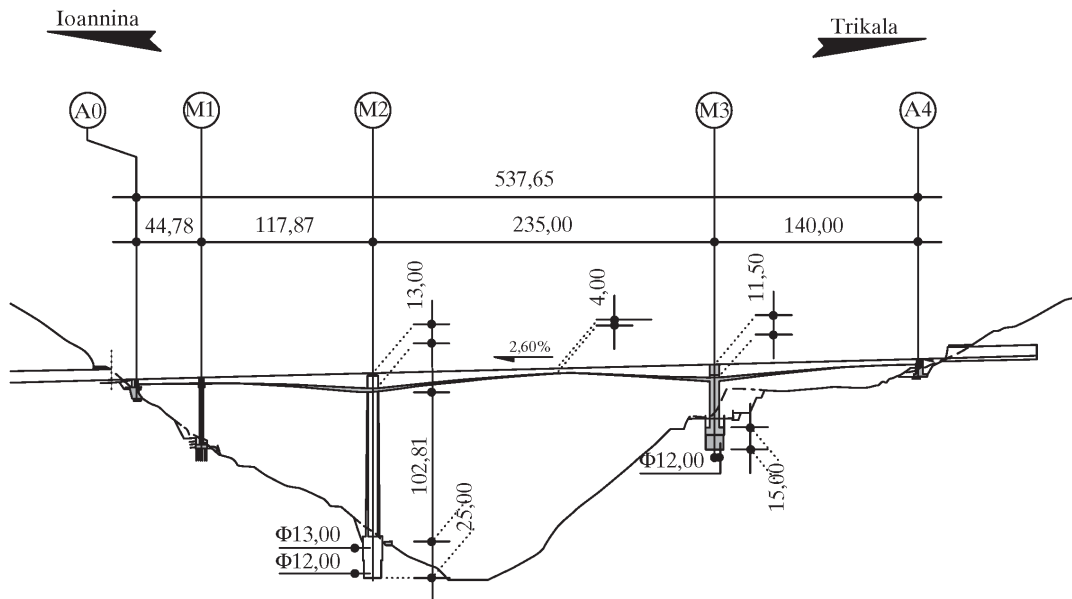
Longitudinal view of the Metsovo bridge.
